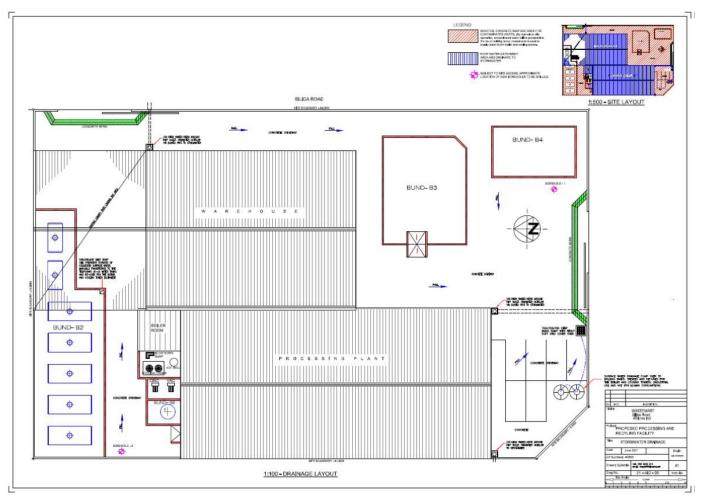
Stormwater Drainage Layout (illustrating location of monitoring boreholes)
